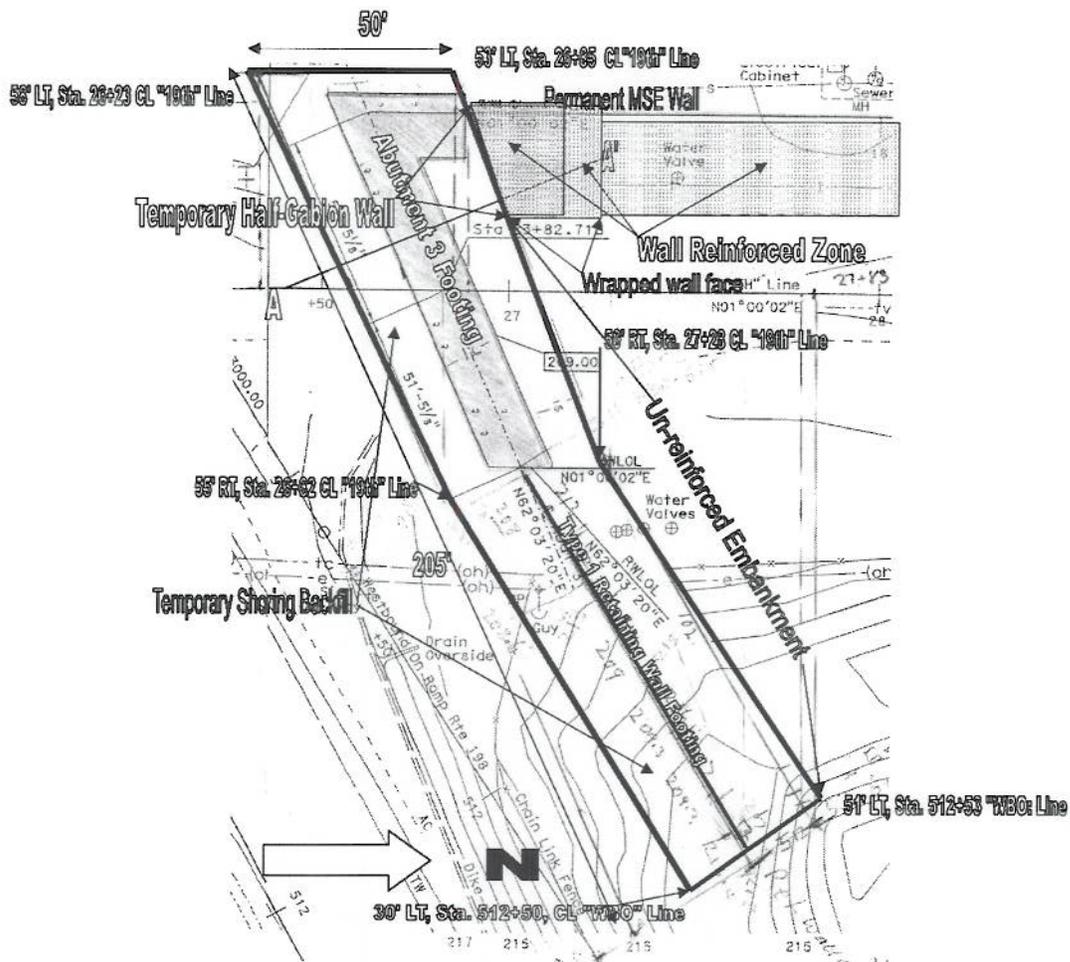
Locations of the half gabion wall and the temporary shoring backfill
